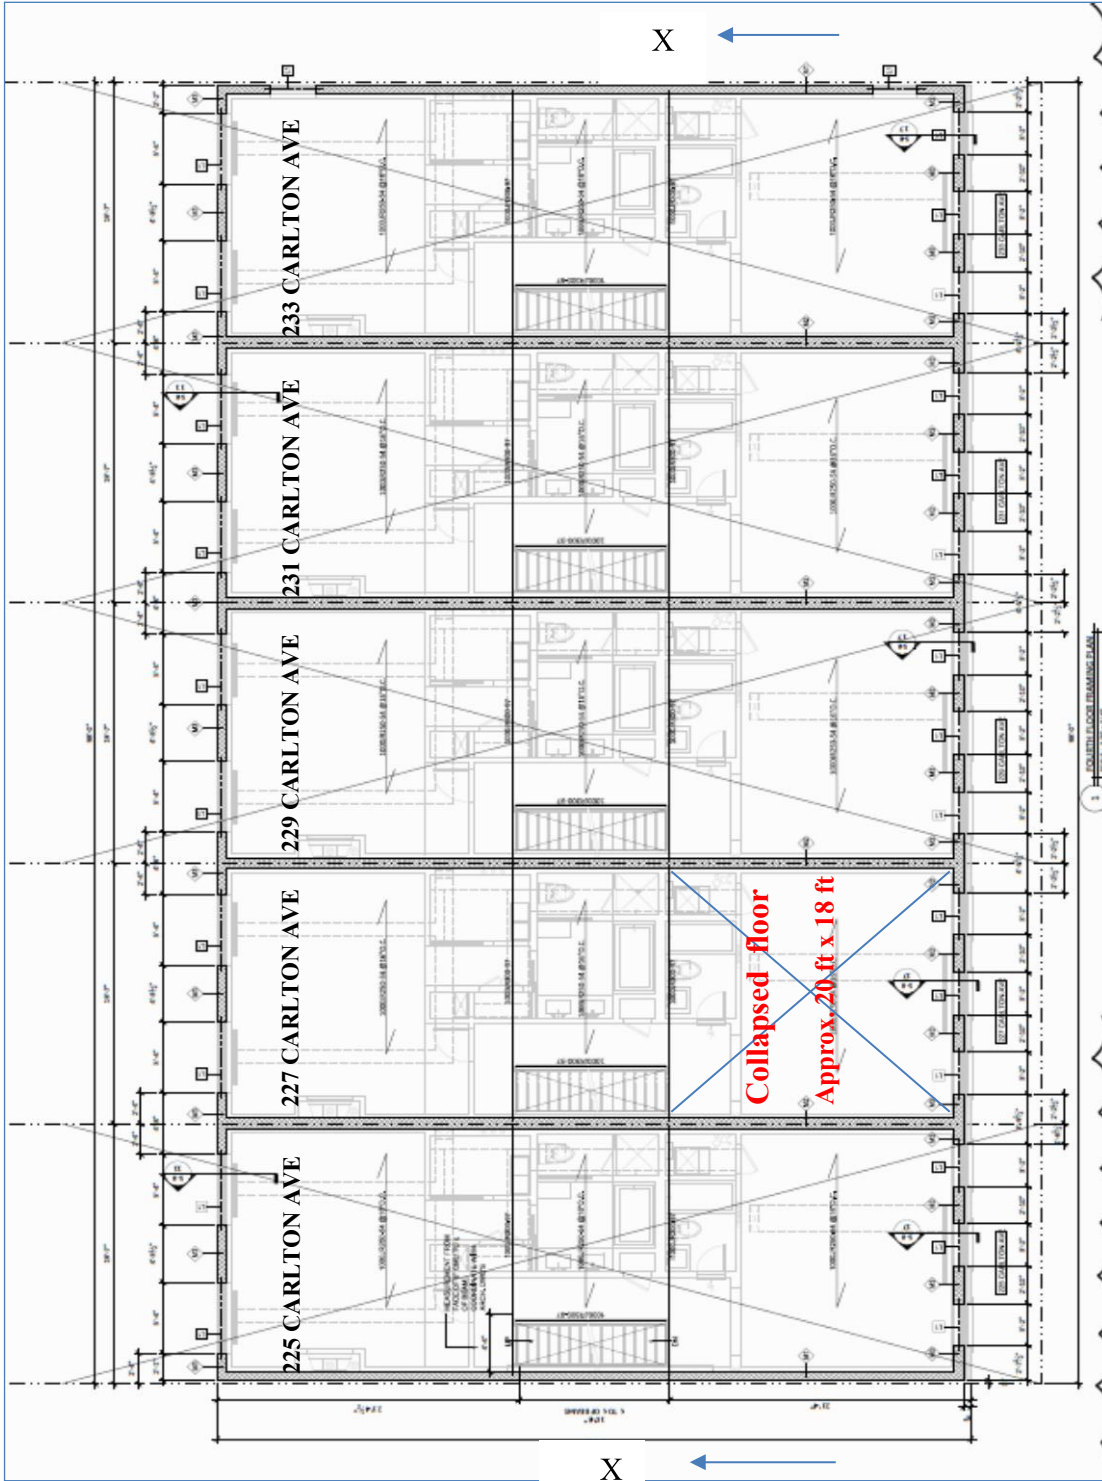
Fourth floor plan - Carlton Row Townhouses - after the floors collapsed
